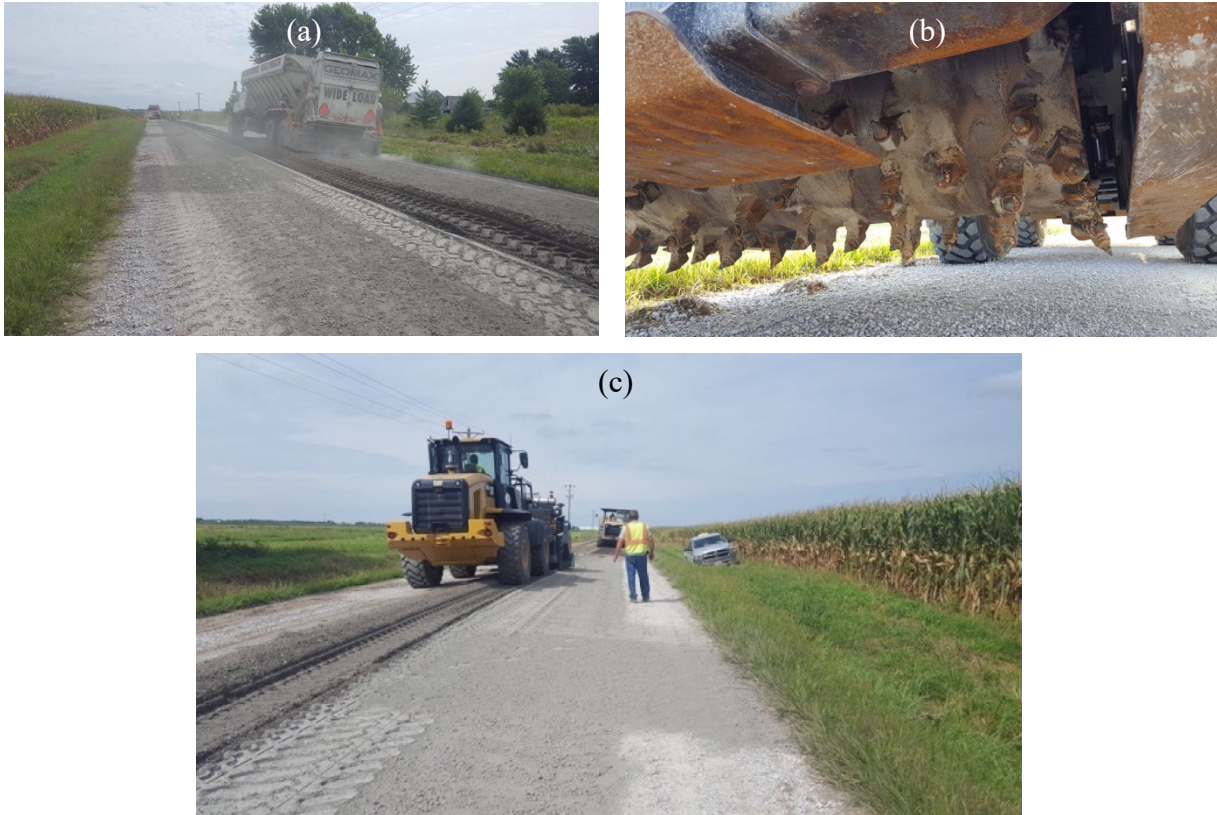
Construction of cement-treated aggregate surface section in Washington County: (a) spreading cement over aggregate surface, (b) depth of milling machine set to 4 in., and (c) mixing cement, aggregate, and water using milling machine
